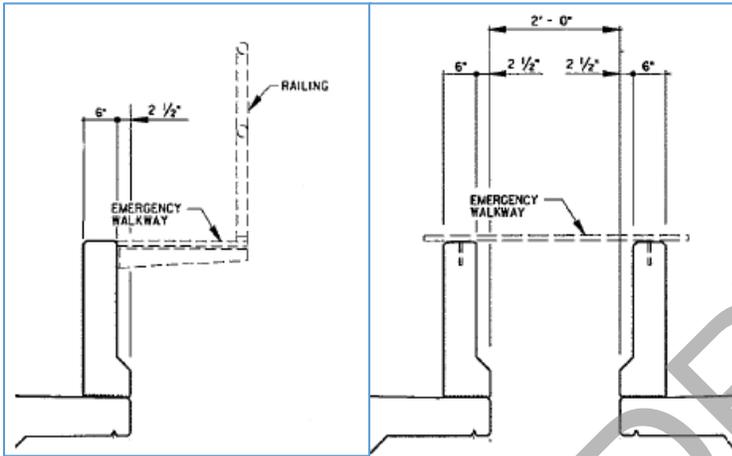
EMERGENCY WALKWAY FOR SINGLE (LEFT) & TANGENT (RIGHT) GUIDEWAYS
